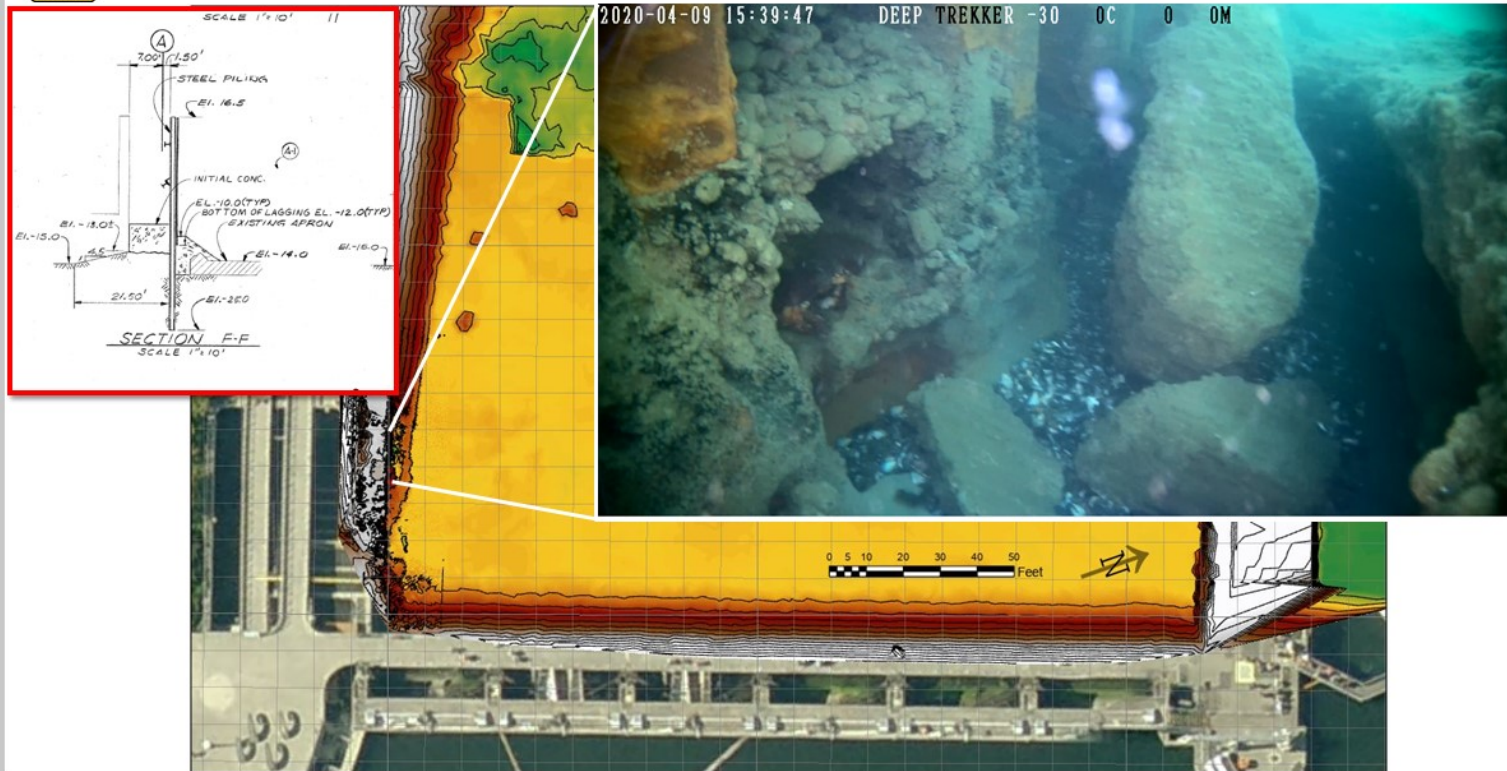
Missing concrete and exposed foundation between the stilling basin apron and the fish ladder sheet pile wall.
